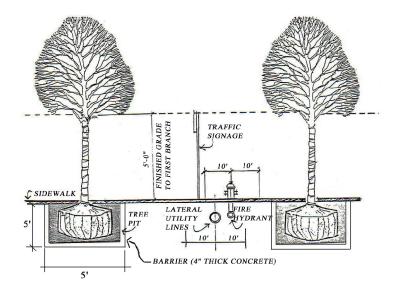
TREE SPACING ADJACENT TO UTILITIES
